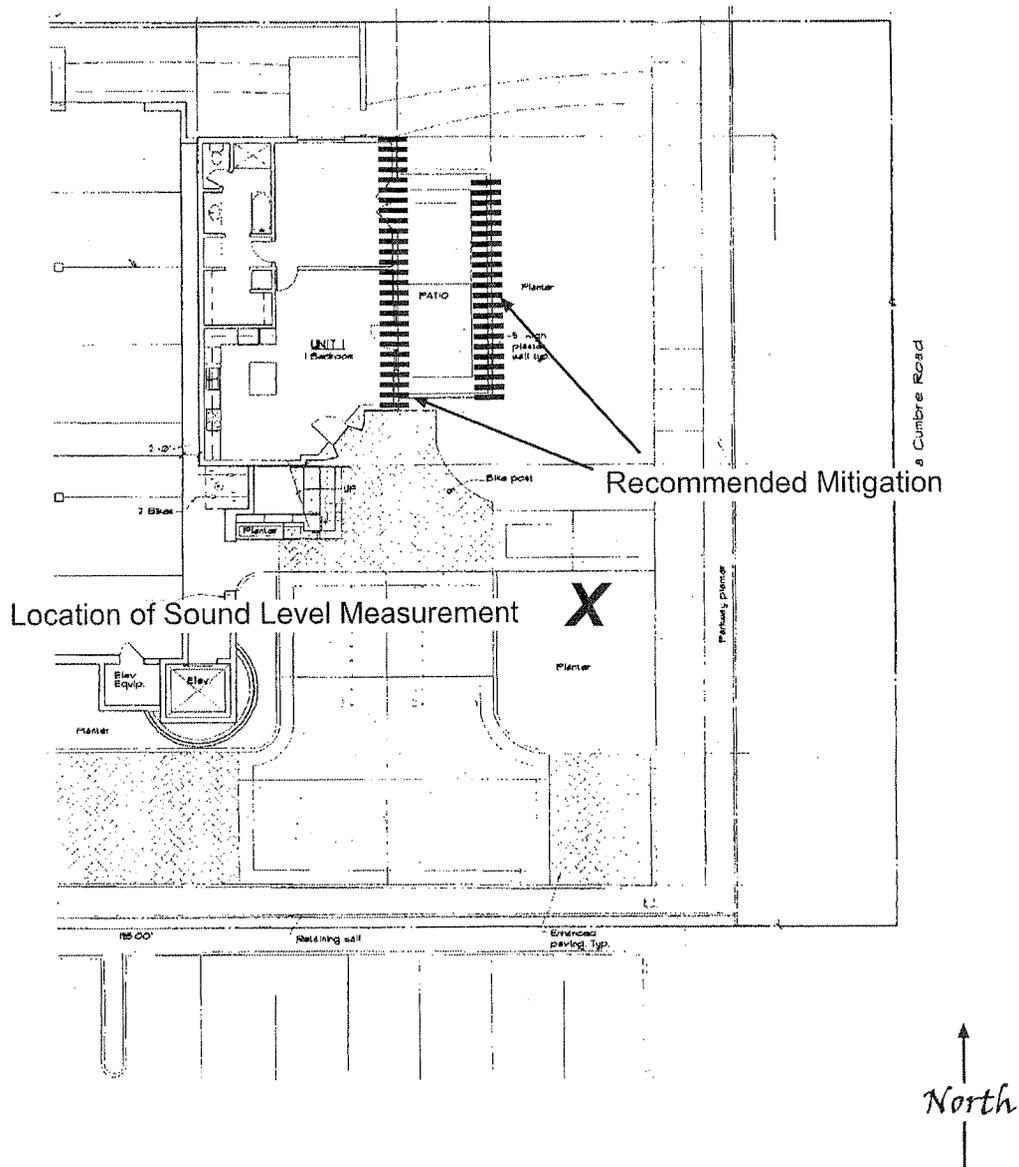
Plan of first floor, showing location of recommended noise mitigation, as described in the text [not to scale].
